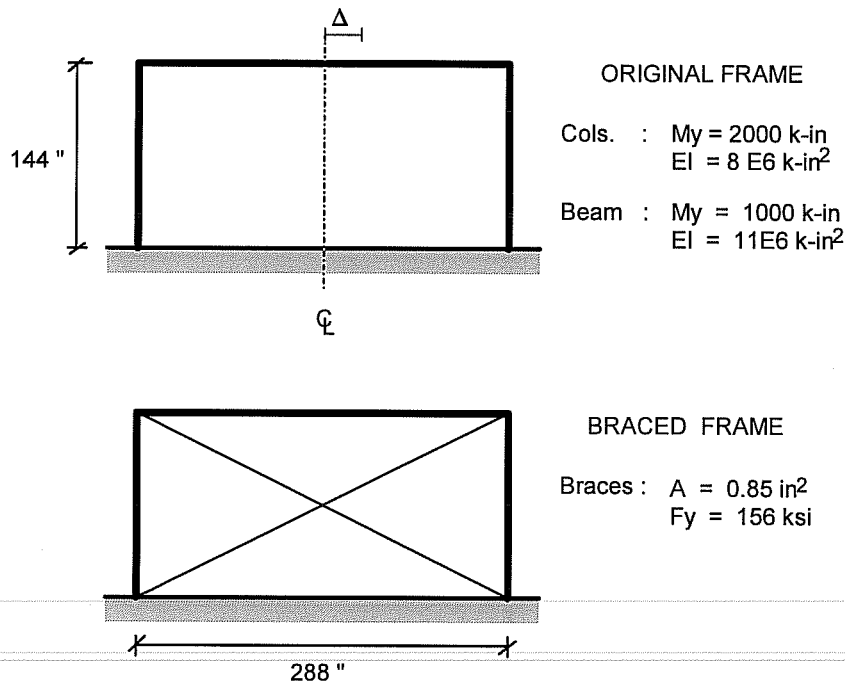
Single-story, single-bay reinforced concrete frame. Original bare frame and braced frame with high-strength slender braces.
